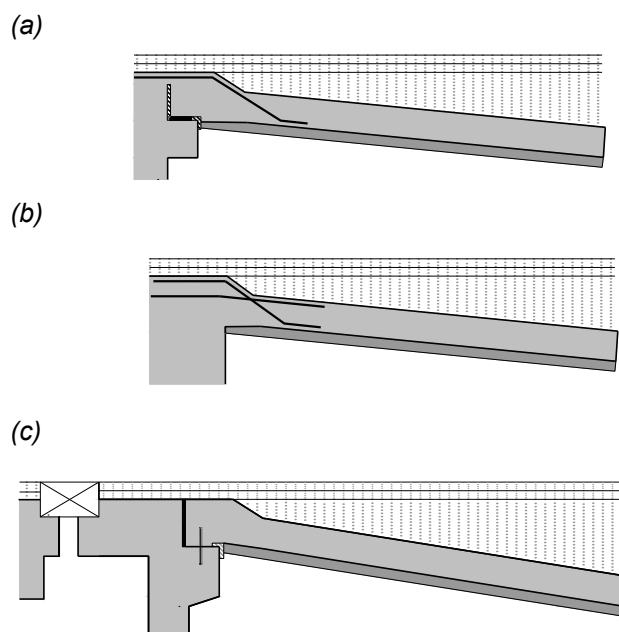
Connection details between abutment and transition slab: (a) detail recommended by FEDRO [OFROU 2011] for integral and semi-integral abutments; (b) new improved detail for standard and integral abutments [DREIER 2011]; (c) detail for standard abutments with expansion joints according to FEDRO [OFROU 2011]
